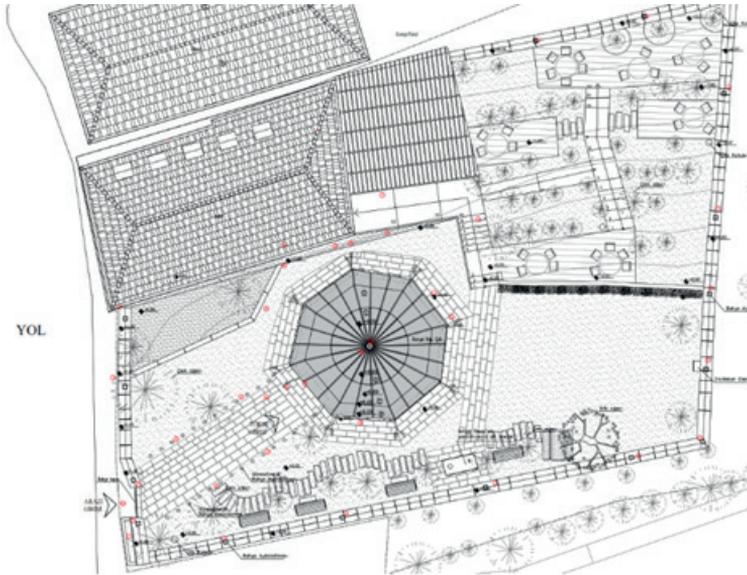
The site plan of the Ismail Dede Tomb restoration project
